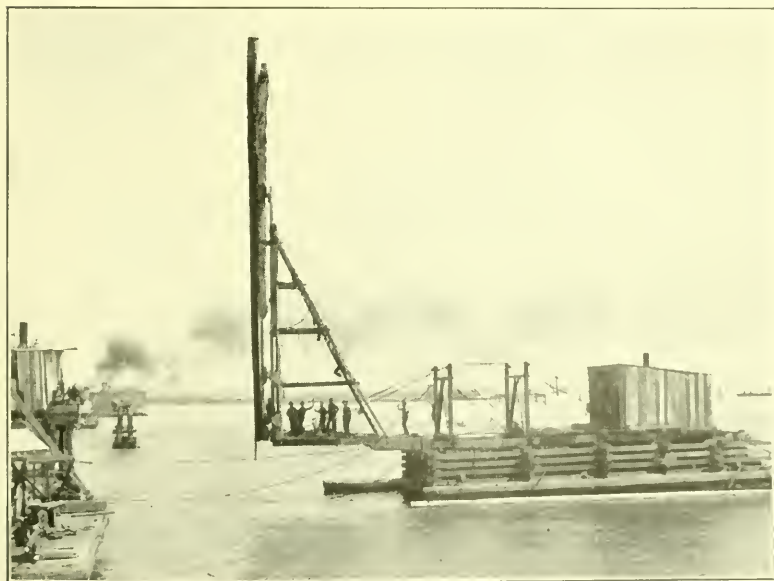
SKID PILE-DRIVER ON SCOW, WITH PILE CUT-OFF IN GINS, EAST
